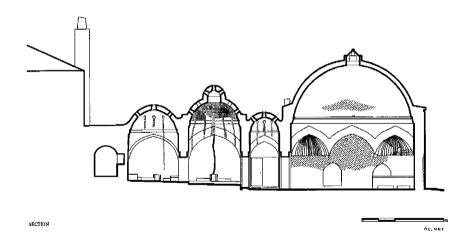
Visualisation of structural failures and material deterioration of the longitudinal section.
